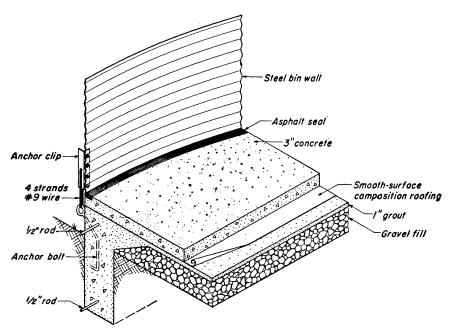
Concrete floor and foundation for steel grain bin. Floor is 1 inch or more above lower edge of bin wall. Note moisture barrier, asphalt seal at wall, and means of anchoring bin to foundation.
